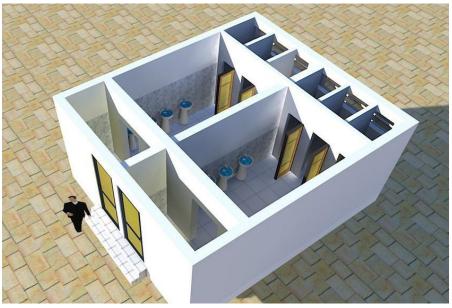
3D LAYOUT OF PUBLIC TOILET
